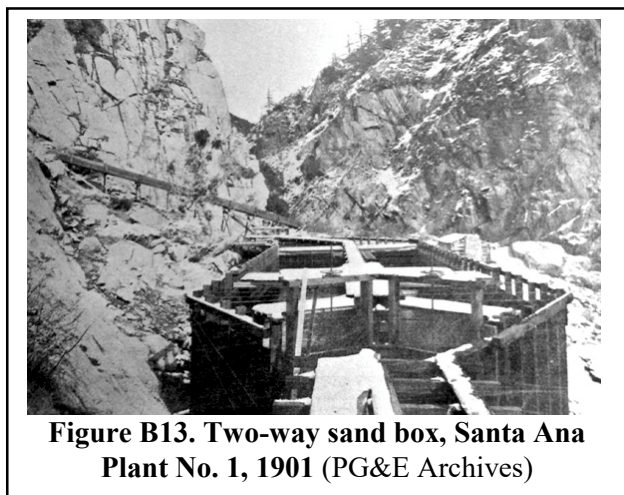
Two-way sand box, Santa Ana Plant No. 1, 1901 (PG&E Archives)
